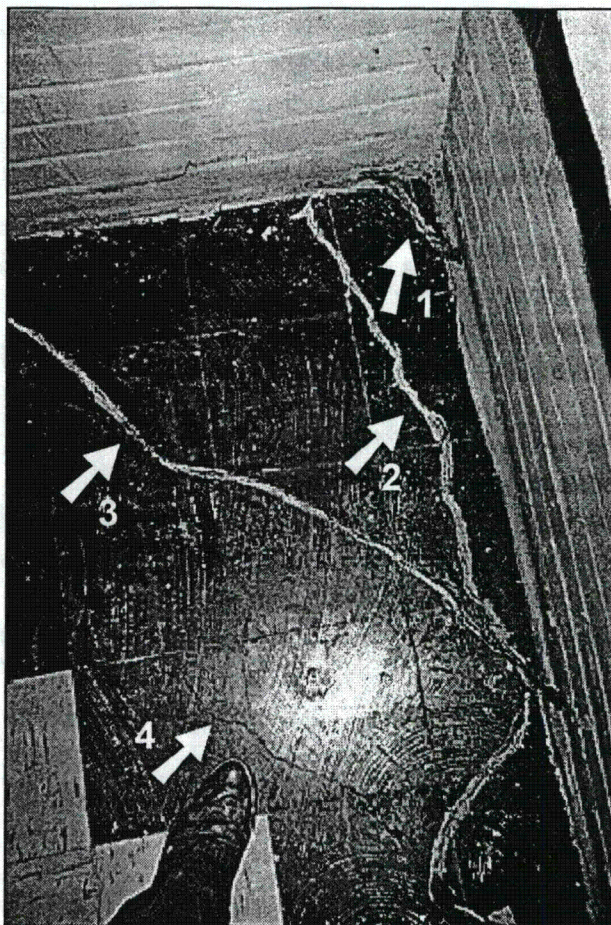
Cracked second floor slab at southeast corner wall.
